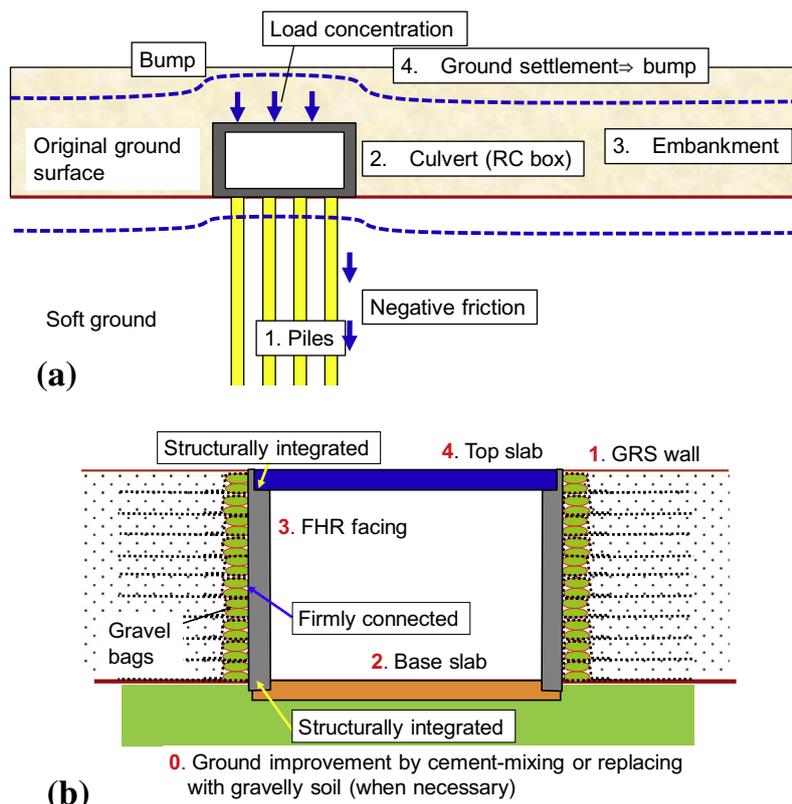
(a) Typical problems with a box culvert structure crossing motorway/railway embankment constructed by the conventional method on a deep soft deposit (the numbers indicate the construction sequence); and (b) most recommendable construction method of a box culvert taking advantage of the “GRS RW with FHR facing technology” (Fig. 3): the numbers show the construction sequence.
